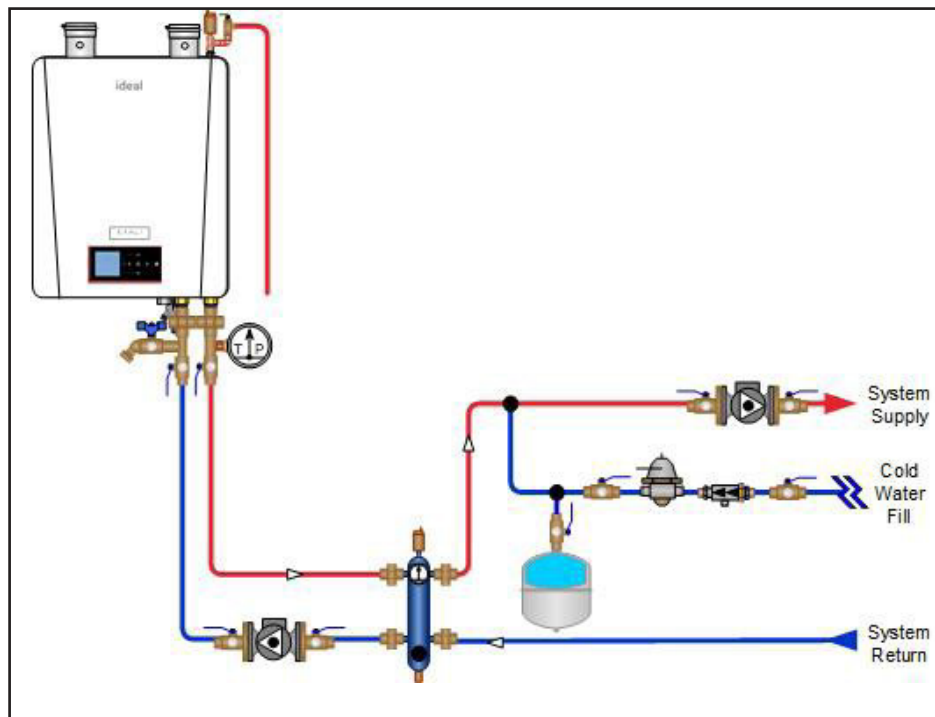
Exalt Solo Near Boiler Piping with Hydraulic Separator
